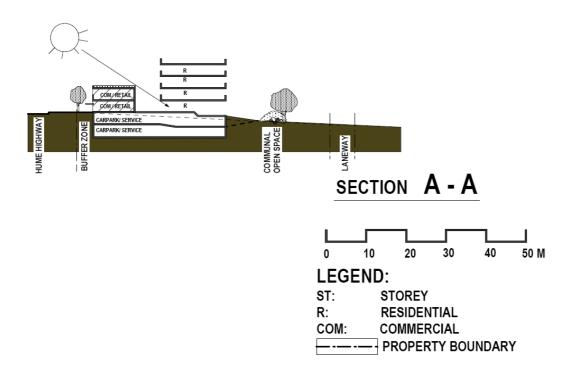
Proposed building envelope for development on the consolidated site as viewed from the Hume Highway (not to scale)
